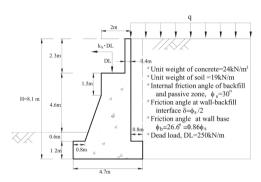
Cross-section of the gravity abutment analyzed in the present study.
